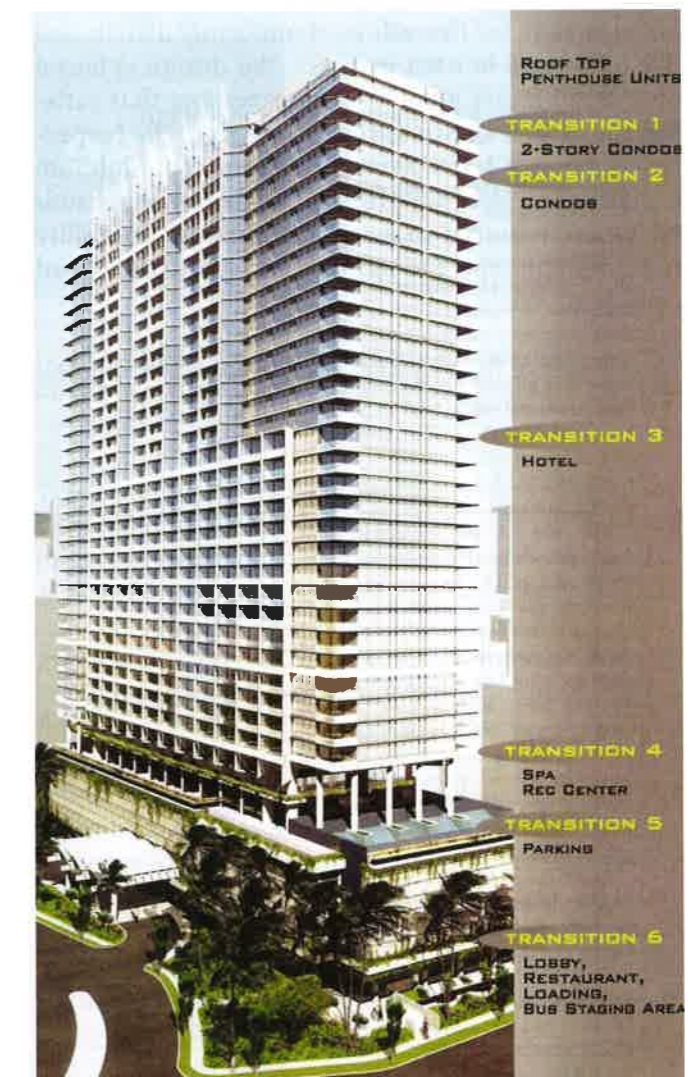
A-2 Multi-Story Post-Tensioned Building in Hawaii (P209)
